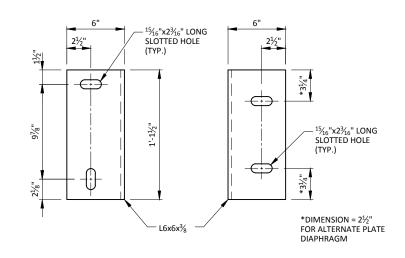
# DETAIL B(FOR STAGGERED DIAPHRAGMS)
